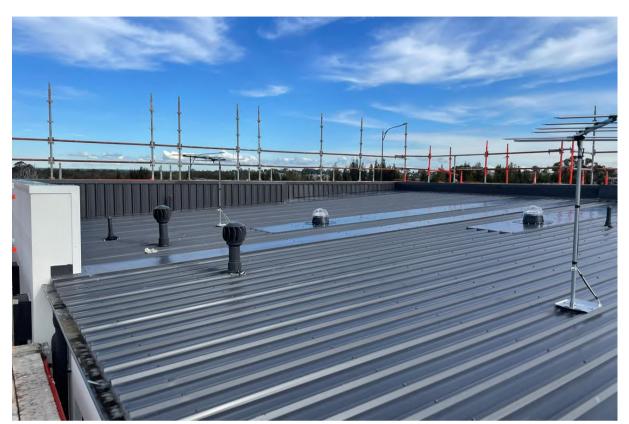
Turbine ventilator (wind-driven) connected to under-slab drainage layer
